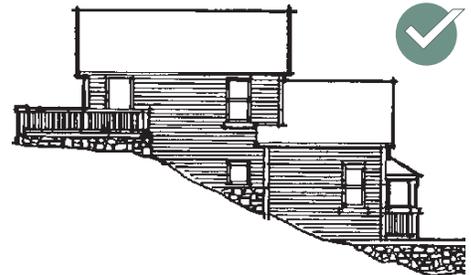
"Terrace" a building into a hillside to minimize the use of "cut and fill" and to create private outdoor spaces and site features.
